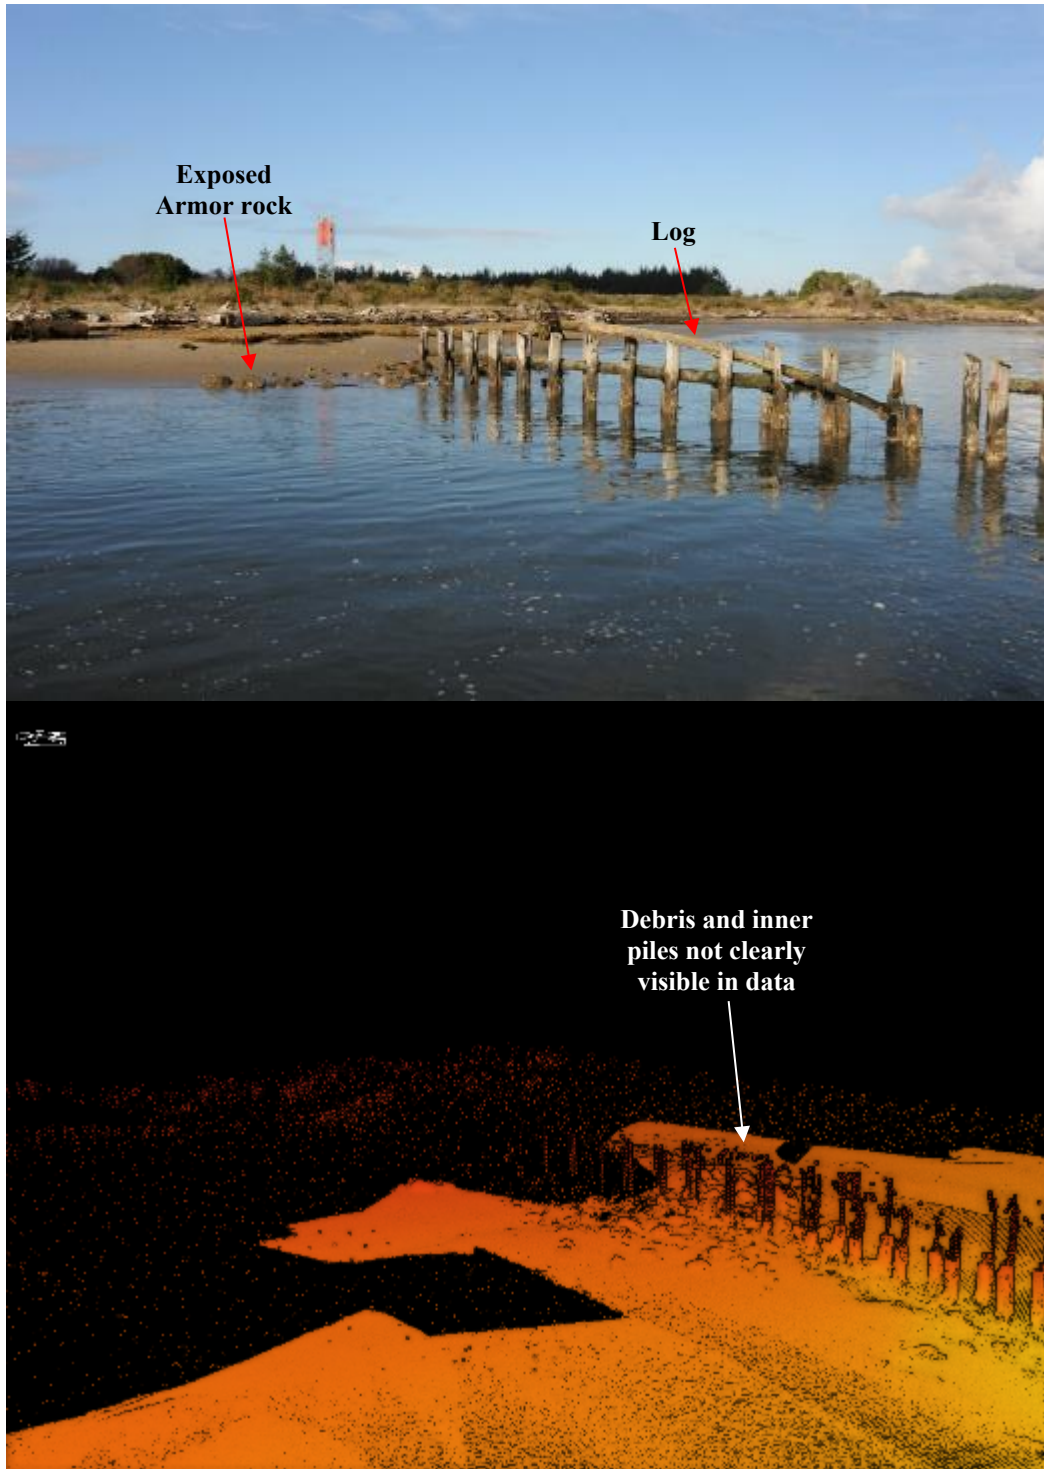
Pile Dike 7.0 viewed from downstream looking shoreward.
